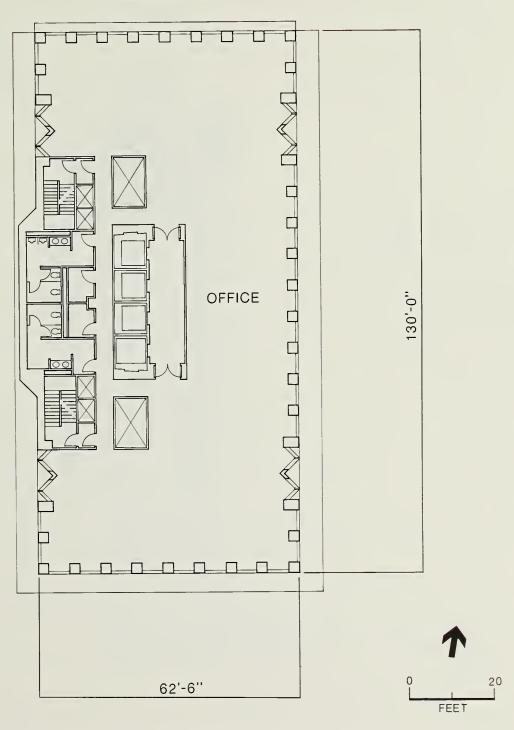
235 PINE TYPICAL OFFICE FLOOR PLAN
